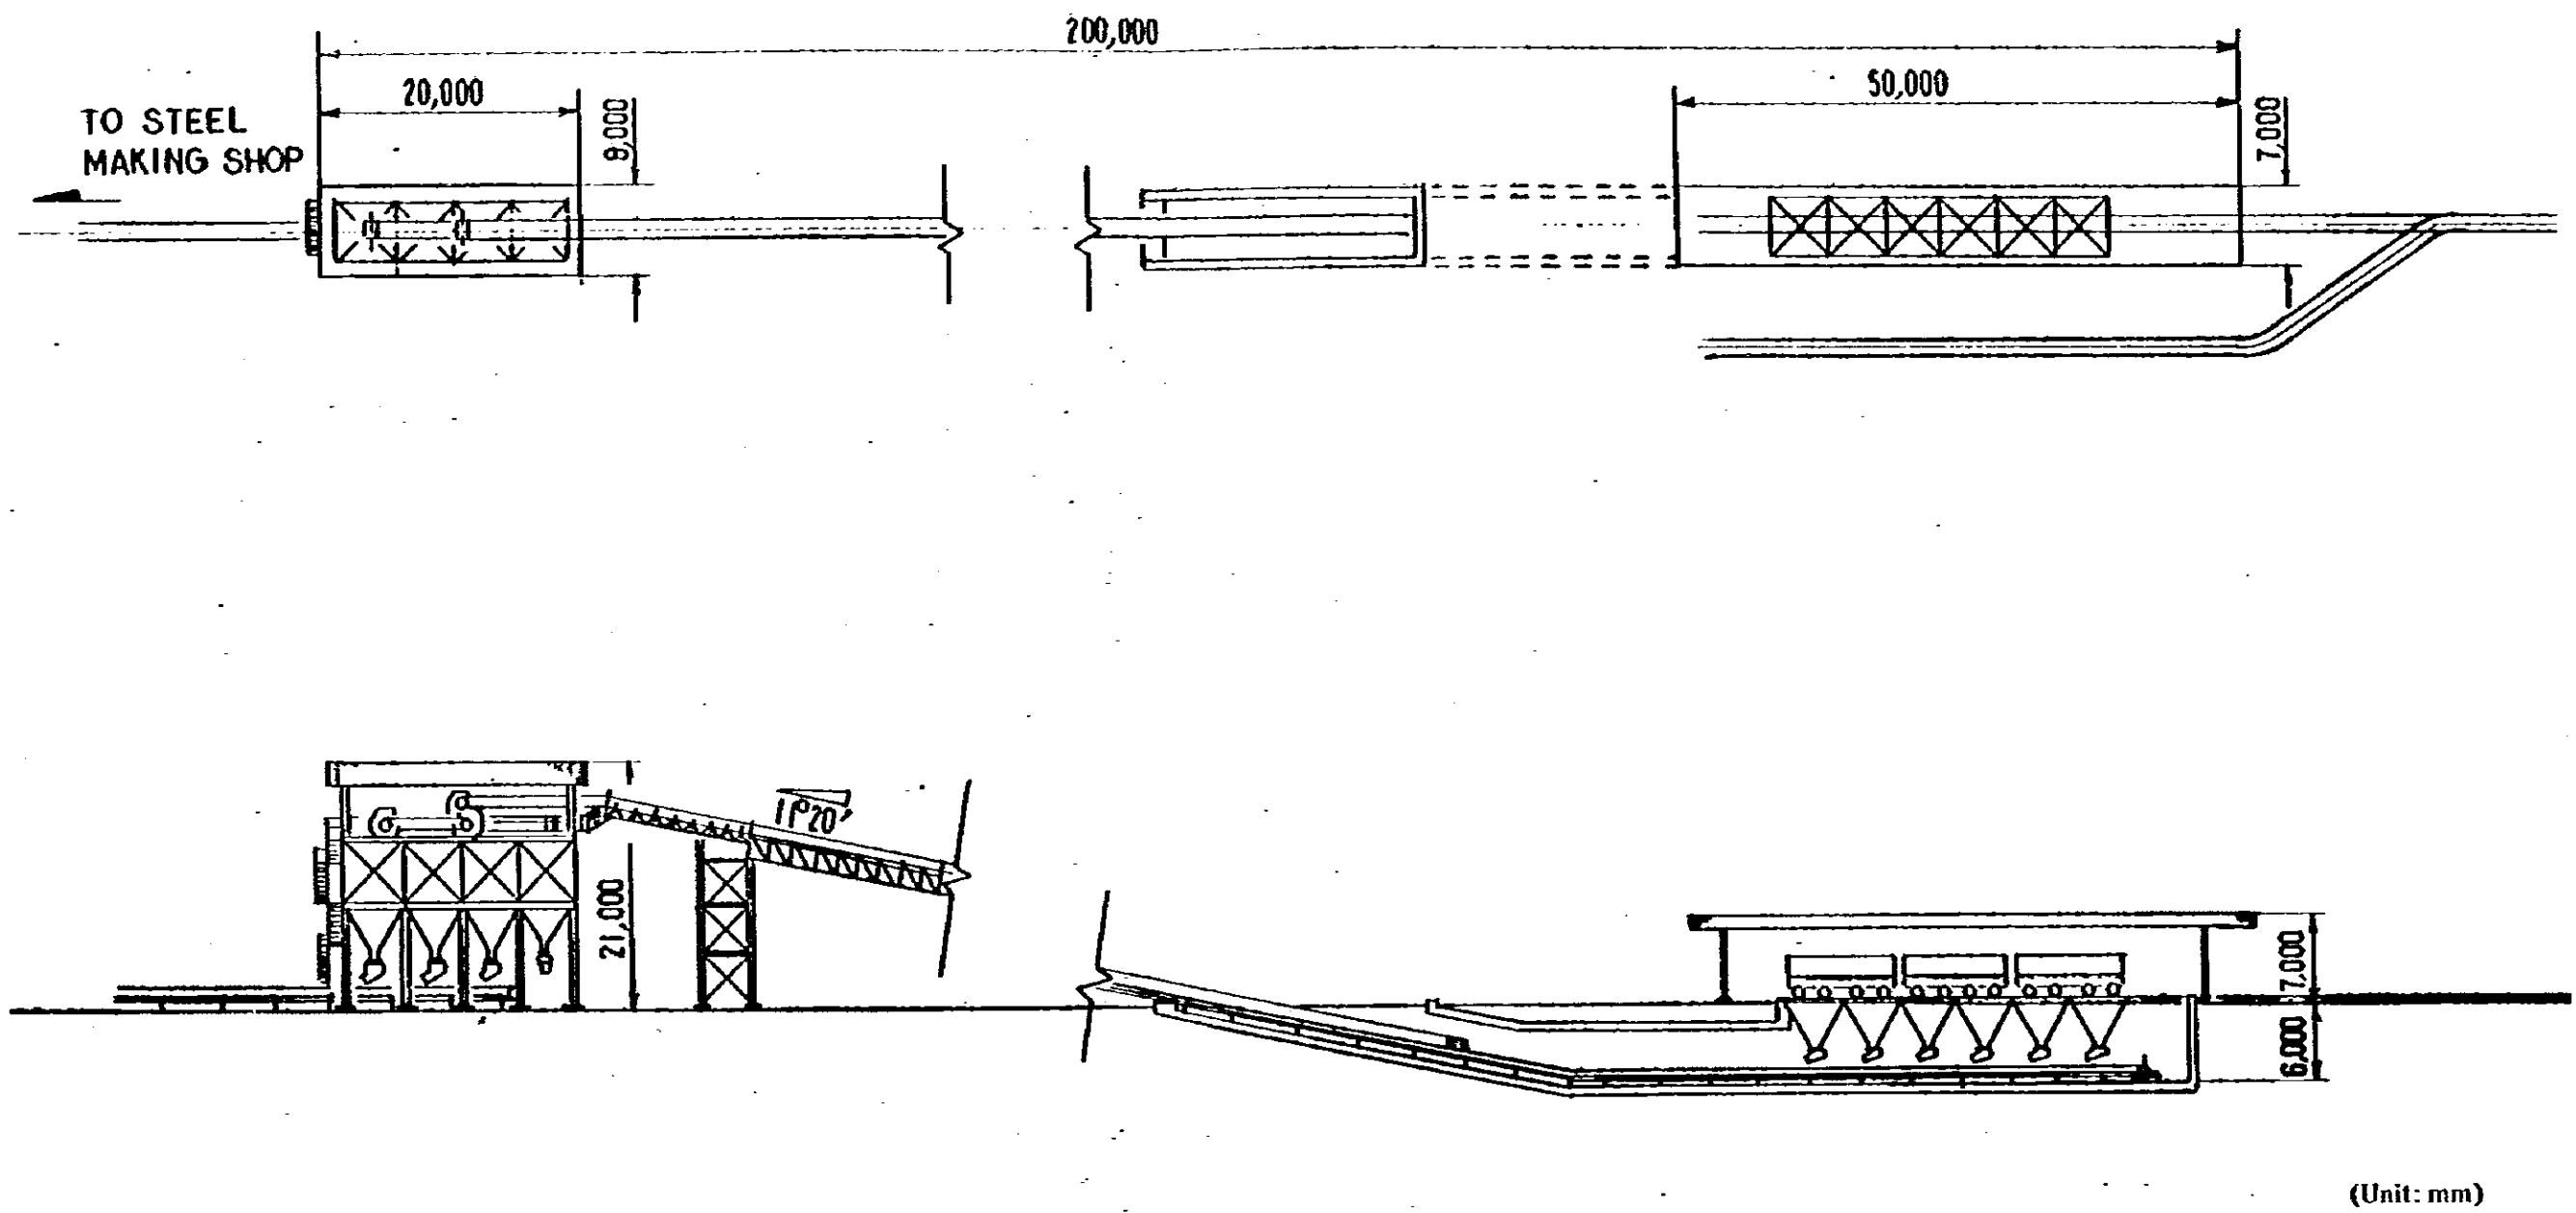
Layout of Sub-material Receiving and Handling Facilities
